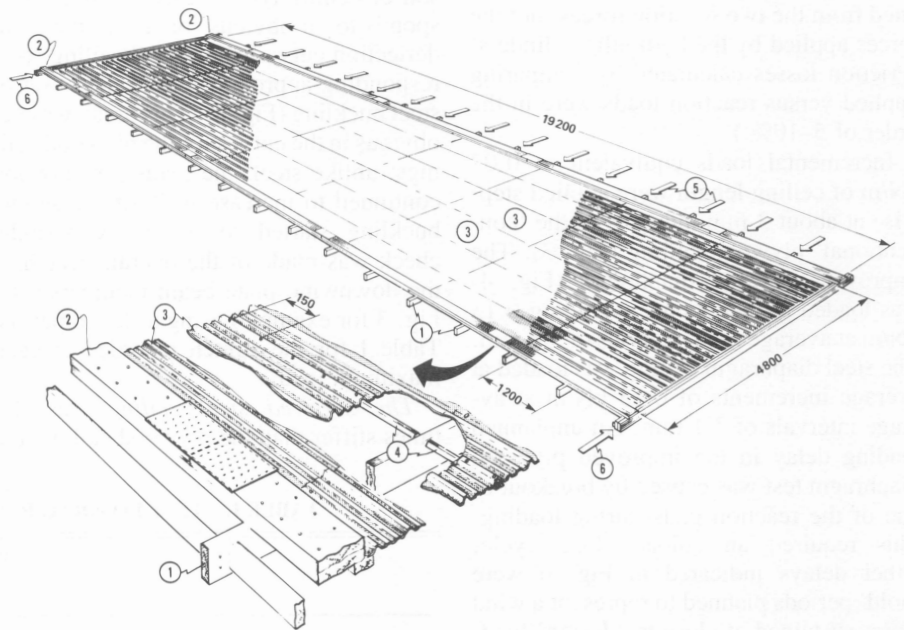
Details of screwed sheet steel diaphragm. (1) 38×140 -mm members represent ceiling joists or roof trusses; (2) beam edge of 2.38×184 mm with steel splice plate at each staggered butt joint; (3) $0.30 \times 900 \times 2540$ -mm galvanized steel siding sheets, with centerline, lapped edges and ends screwed at 150-mm spacing to trusses (1) and blocking (4); (4) blocking cut to fit grooves, from 38×38 mm, loose fit between (1); (5) 15 hydraulic cylinders spaced at 1200 mm; (6) two reaction pads with load cells, anchored to warehouse floor.
